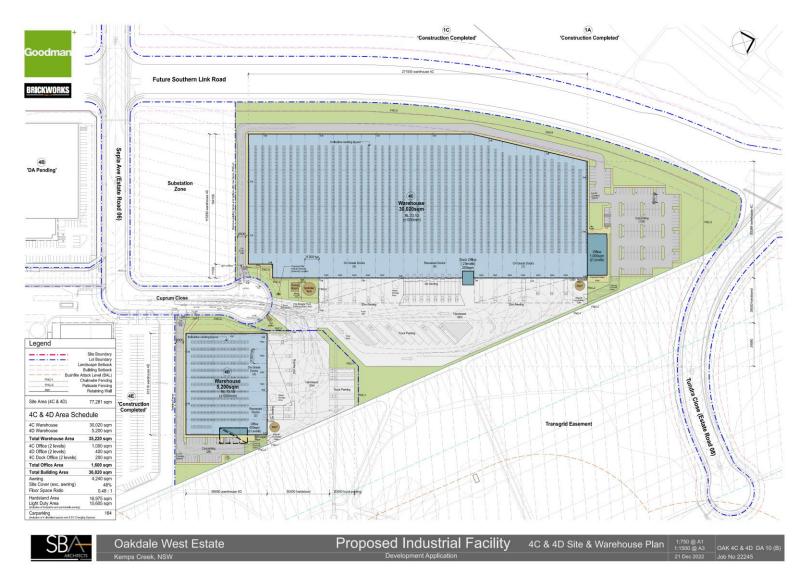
Buildings 4C and 4D - Site & Warehouse Plan
